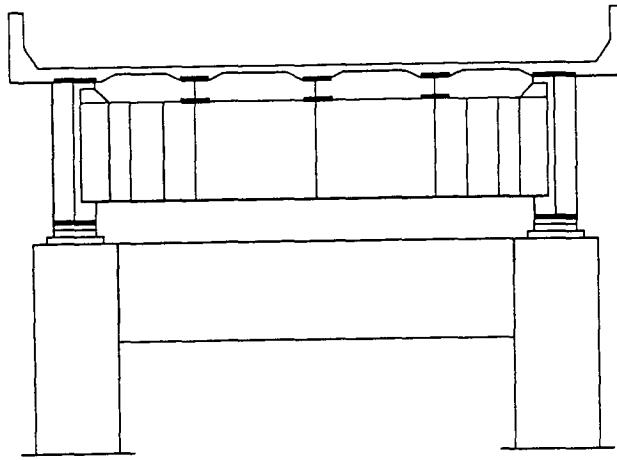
Cross-Section of Bridges Illustrating Transverse Floorbeam
